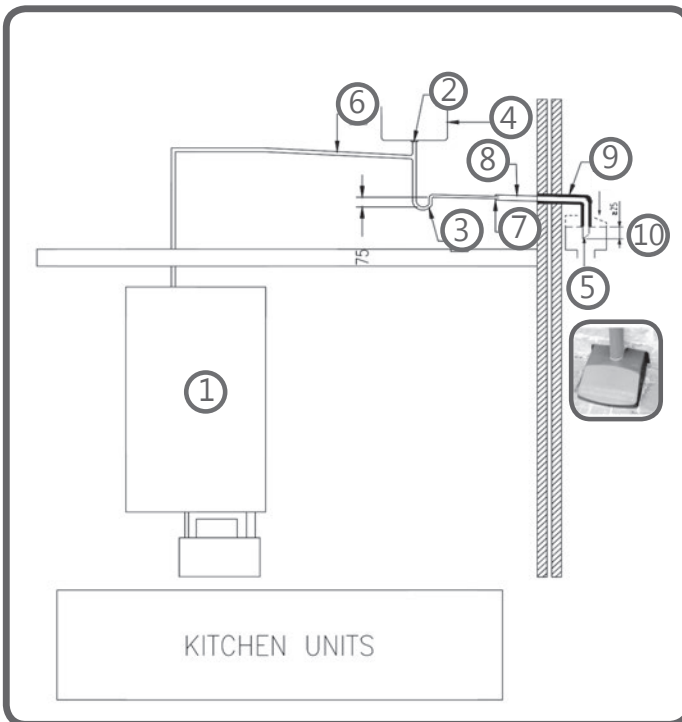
Connection of a condensate pump - typical method (NB manufacturer’s detailed instructions should be followed).
